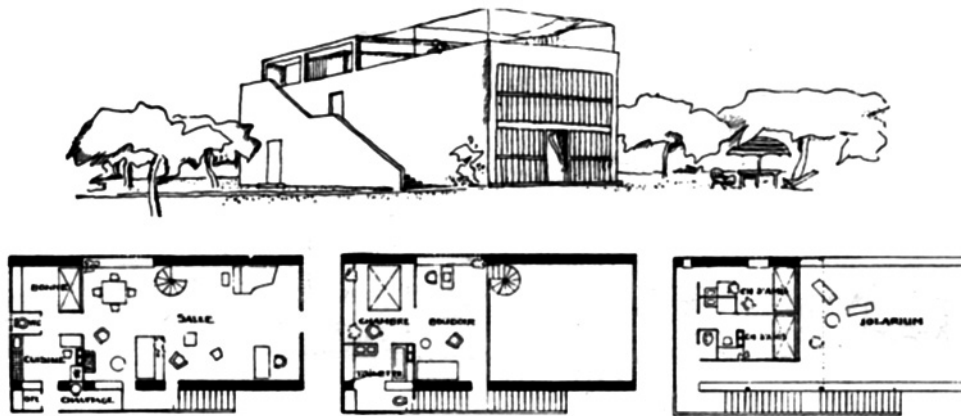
Maison Citrohan, 1919, perspective and plan layout
